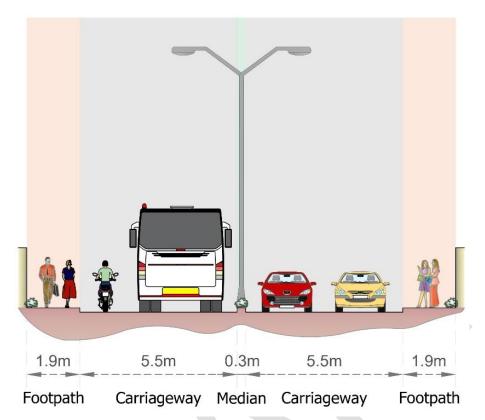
Typical Cross Section of 15m Wide Road with Footpath
